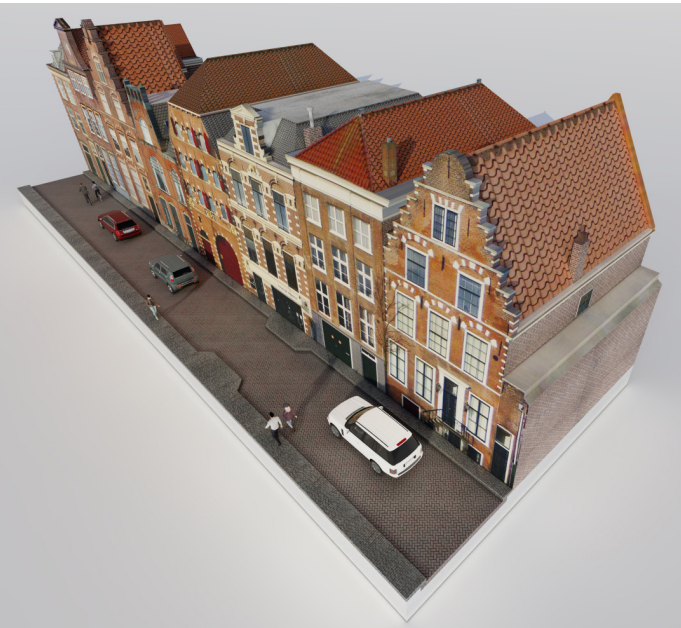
Axonometric street segment of existing situation. Made by Author.
